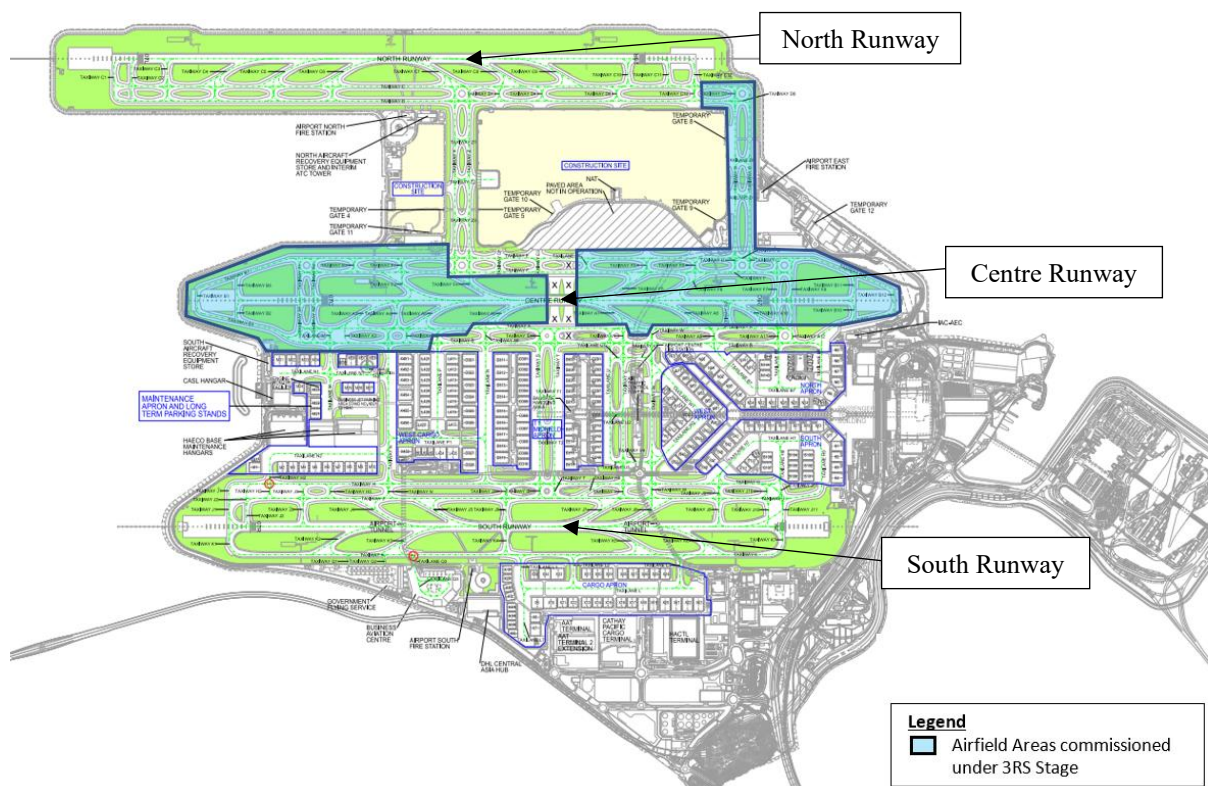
Aerodrome Layout Plan of the HKIA (3RS Stage)
